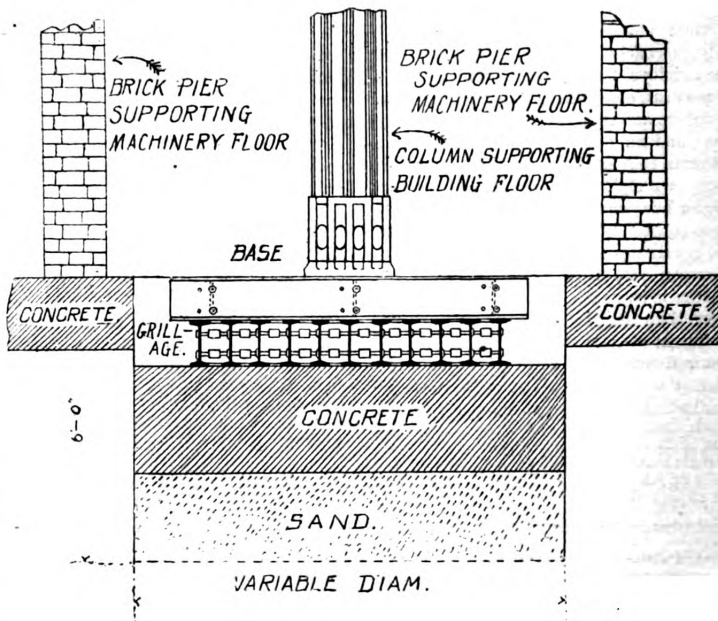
Sectional View Showing Construction of Interior Piers.
